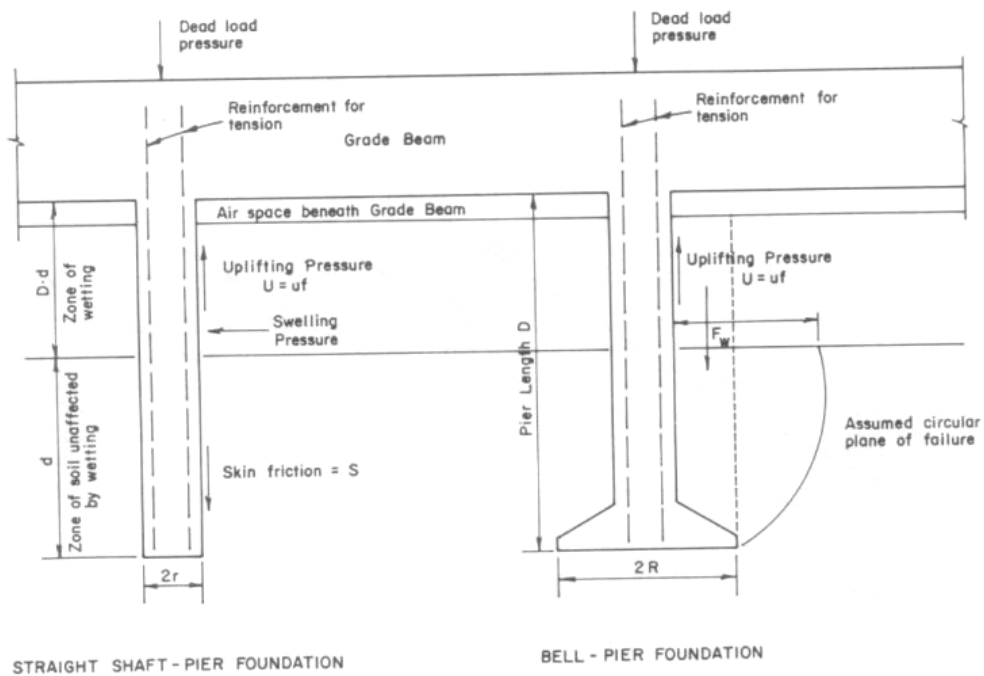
Schematic of drilled pier-grade beam system (Chen 1988).
